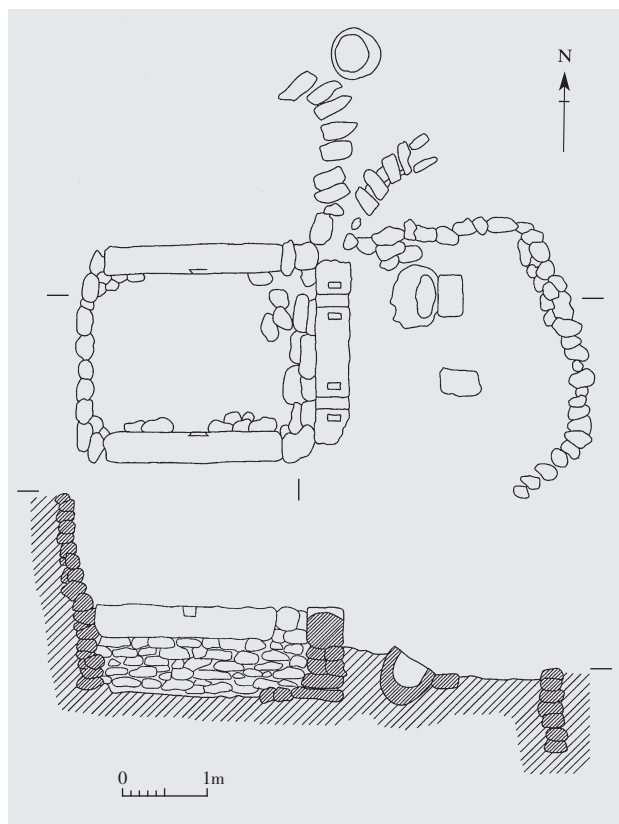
The plan and section of trip hammer 3 at Zhouling Village.
